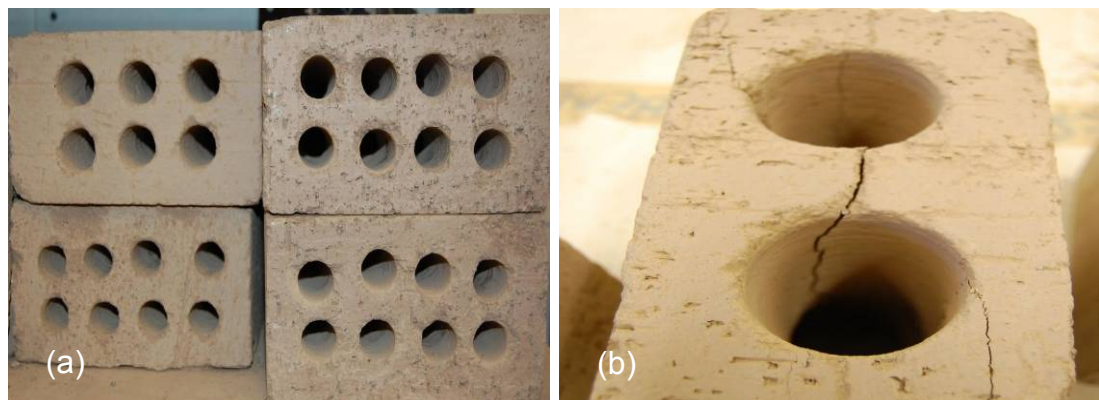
Specimens (180 mm × 105 mm × 212 mm) cut from Unit 1 blocks showing (a) drilled perforations (b) crack appearing between the 2 × 50 mm diameter cored-perforations
